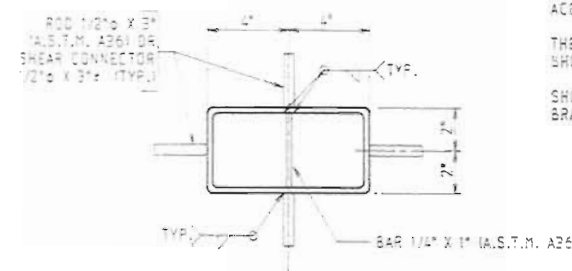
DETAILS OF DRAINS TRANSVERSE TO ROADWAY
